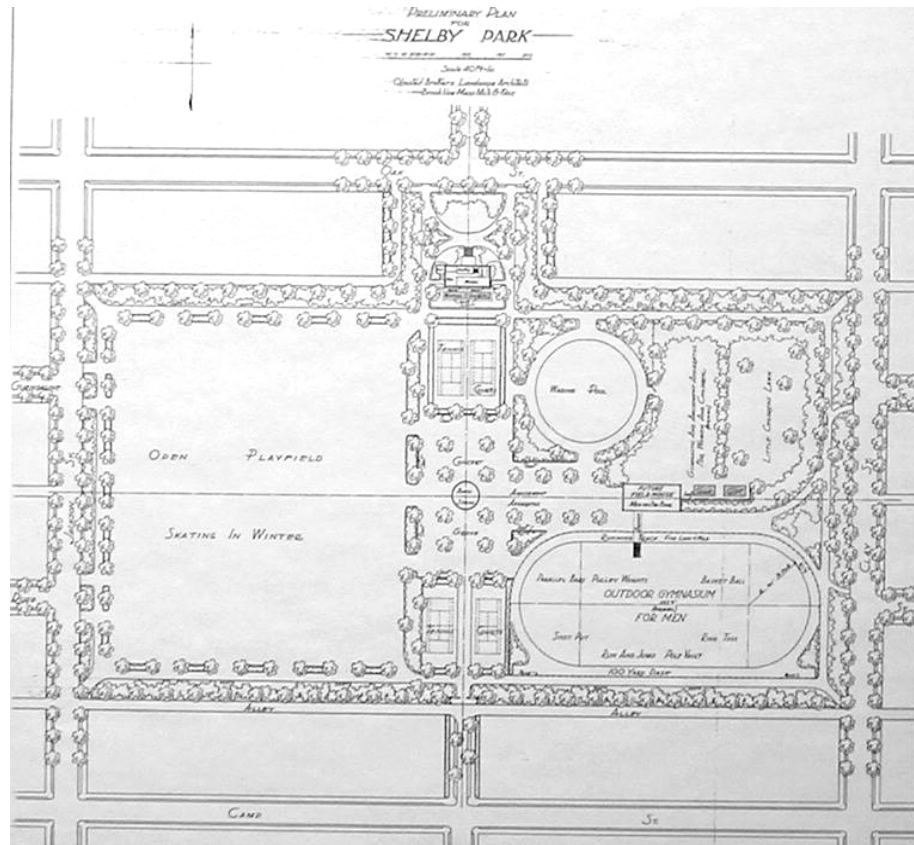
1907 plan for Shelby Park-Plan #7
